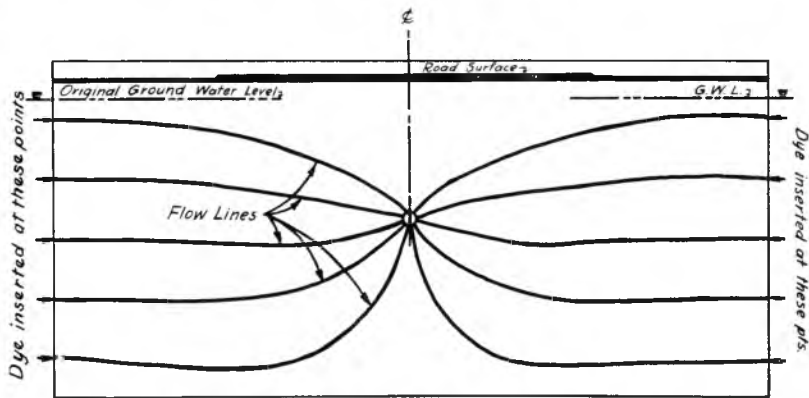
Drain at centerline of roadway. Flat terrain—high ground-water table. Eight-inch perforated pipe laid in 1-foot wide trench. Backfilled with coarse material (all retained on No. 10 sieve). Bottom of pipe is 6 feet below ground-water level.
